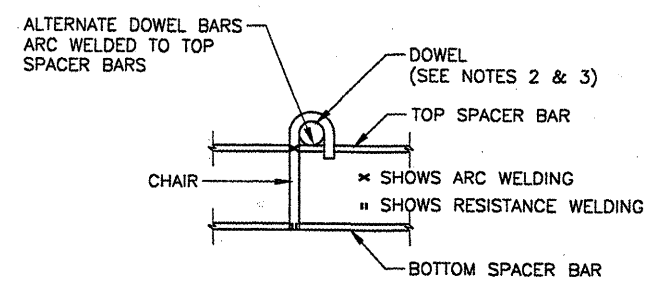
DETAIL 2	DETAIL 3	DETAIL 4	DETAIL 5
